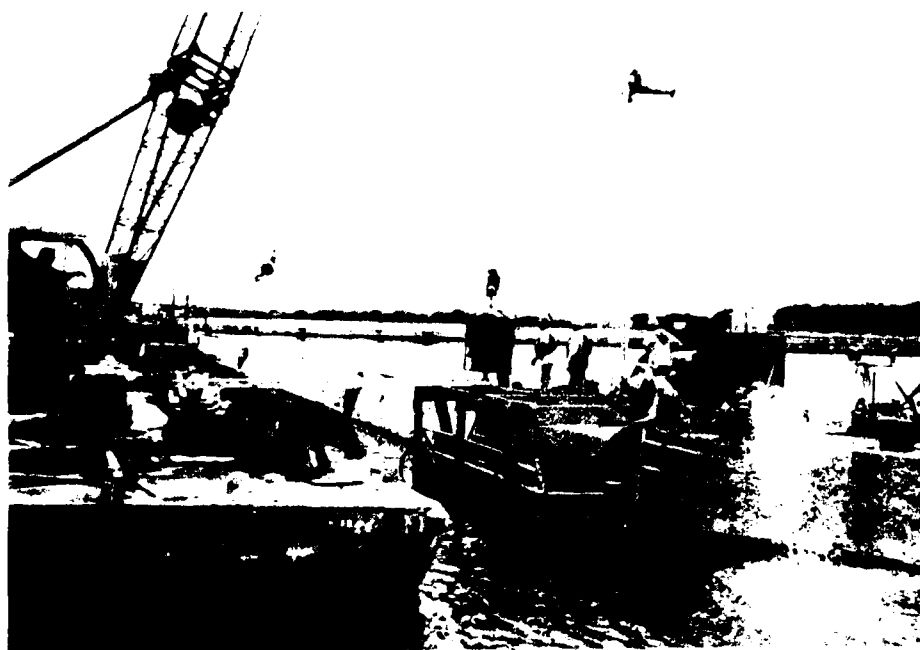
Upper guide wall resurfacing details, Brandon Road Lock
